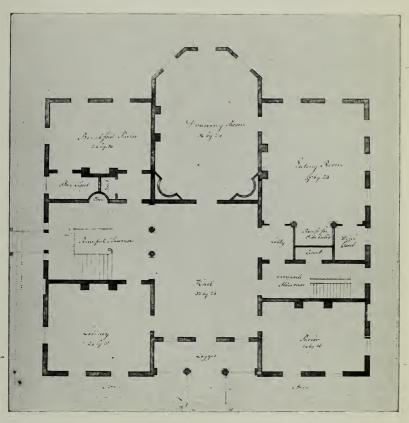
PLAN OF "COLONEL SMITH'S HOUSE," FIRST FLOOR.
